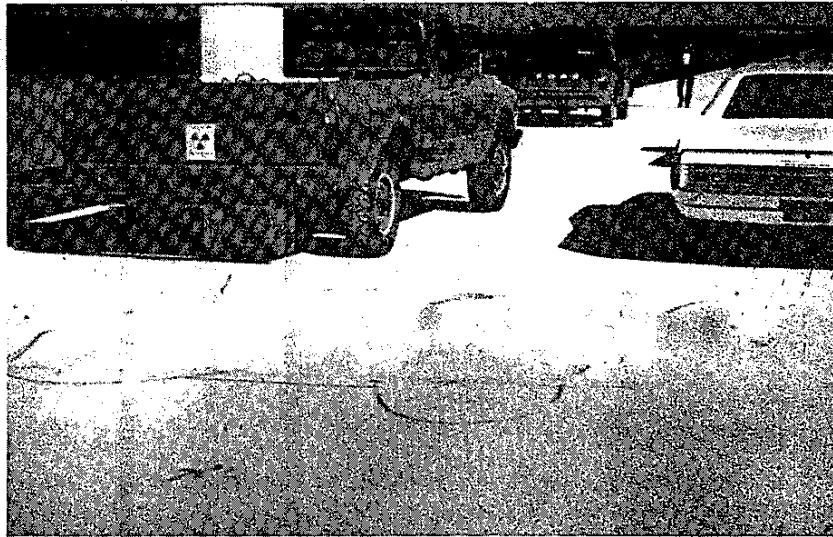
FIELD TEST: PORTLAND CEMENT CONCRETE
